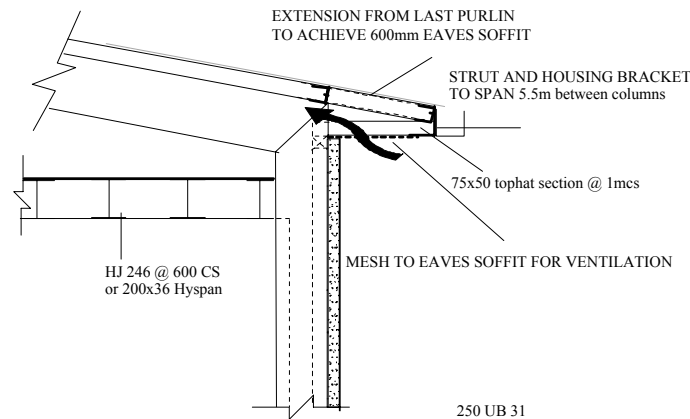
Vented attic space, meshed eaves vent and ridge vent
